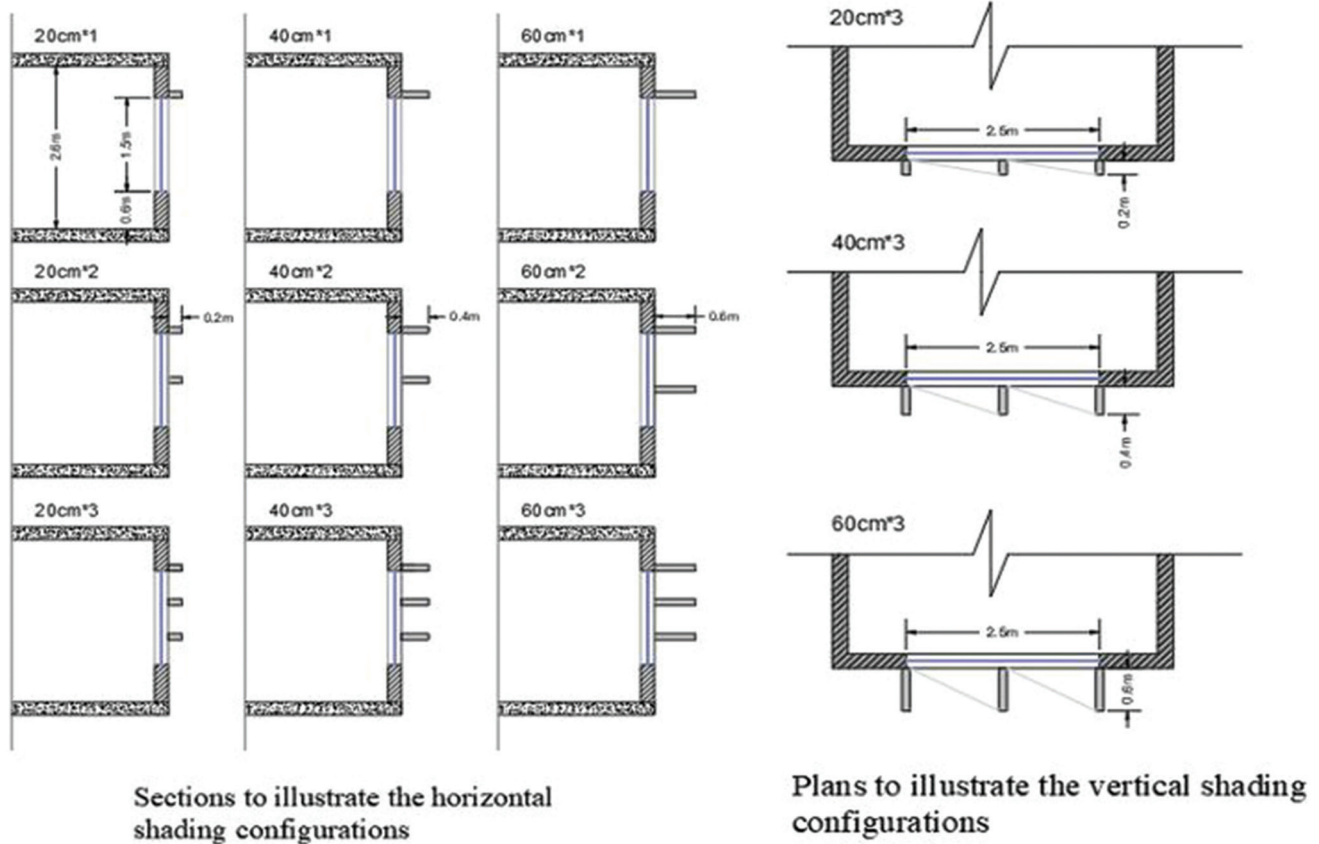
Plans and sections of the shading elements arrangement and dimensions (Source: Author).
